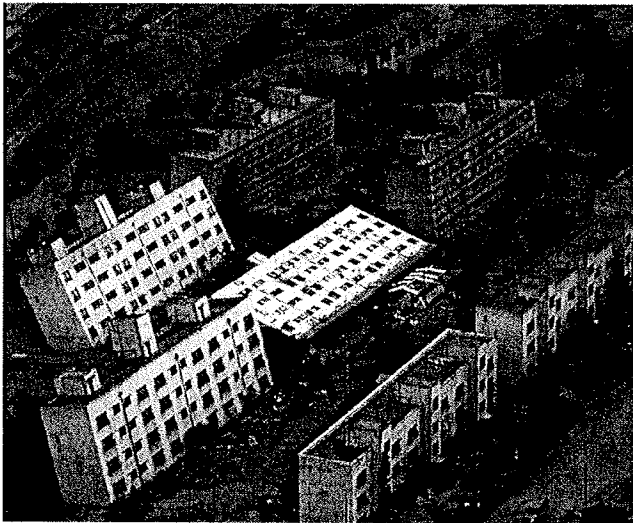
1964 Niigata Japan: Liquefaction caused major settlement. The building at center rotated 70 degrees from vertical. Surprisingly, little structural damage occurred to the apartment buildings. Some buildings were later righted and re-inhabited.
